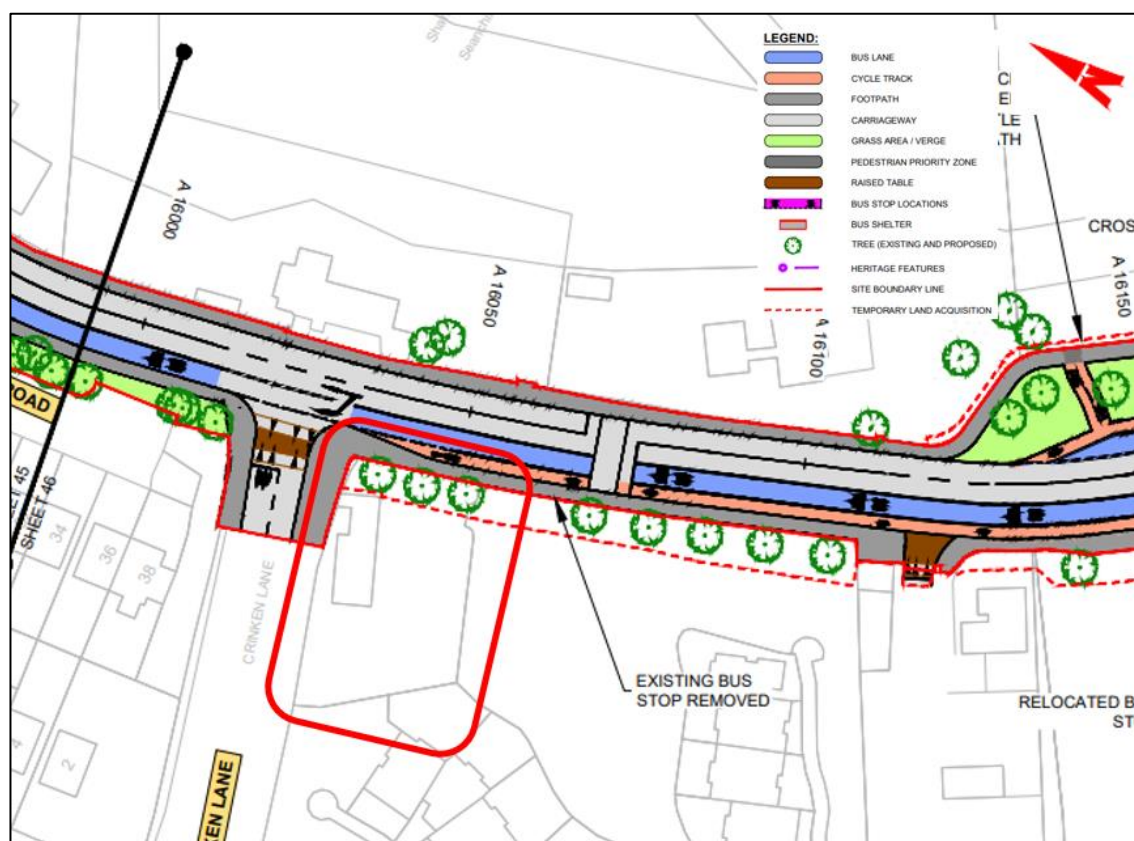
New Proposed Layout at Dublin Road (Sheet 46)
